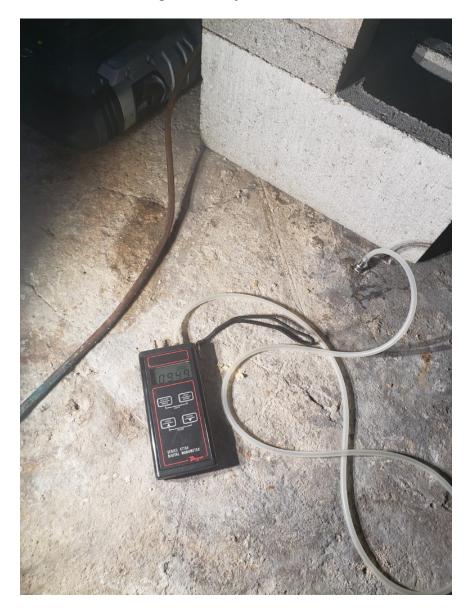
Pickup Point 1 manometer (typical). September 1, 2021.
